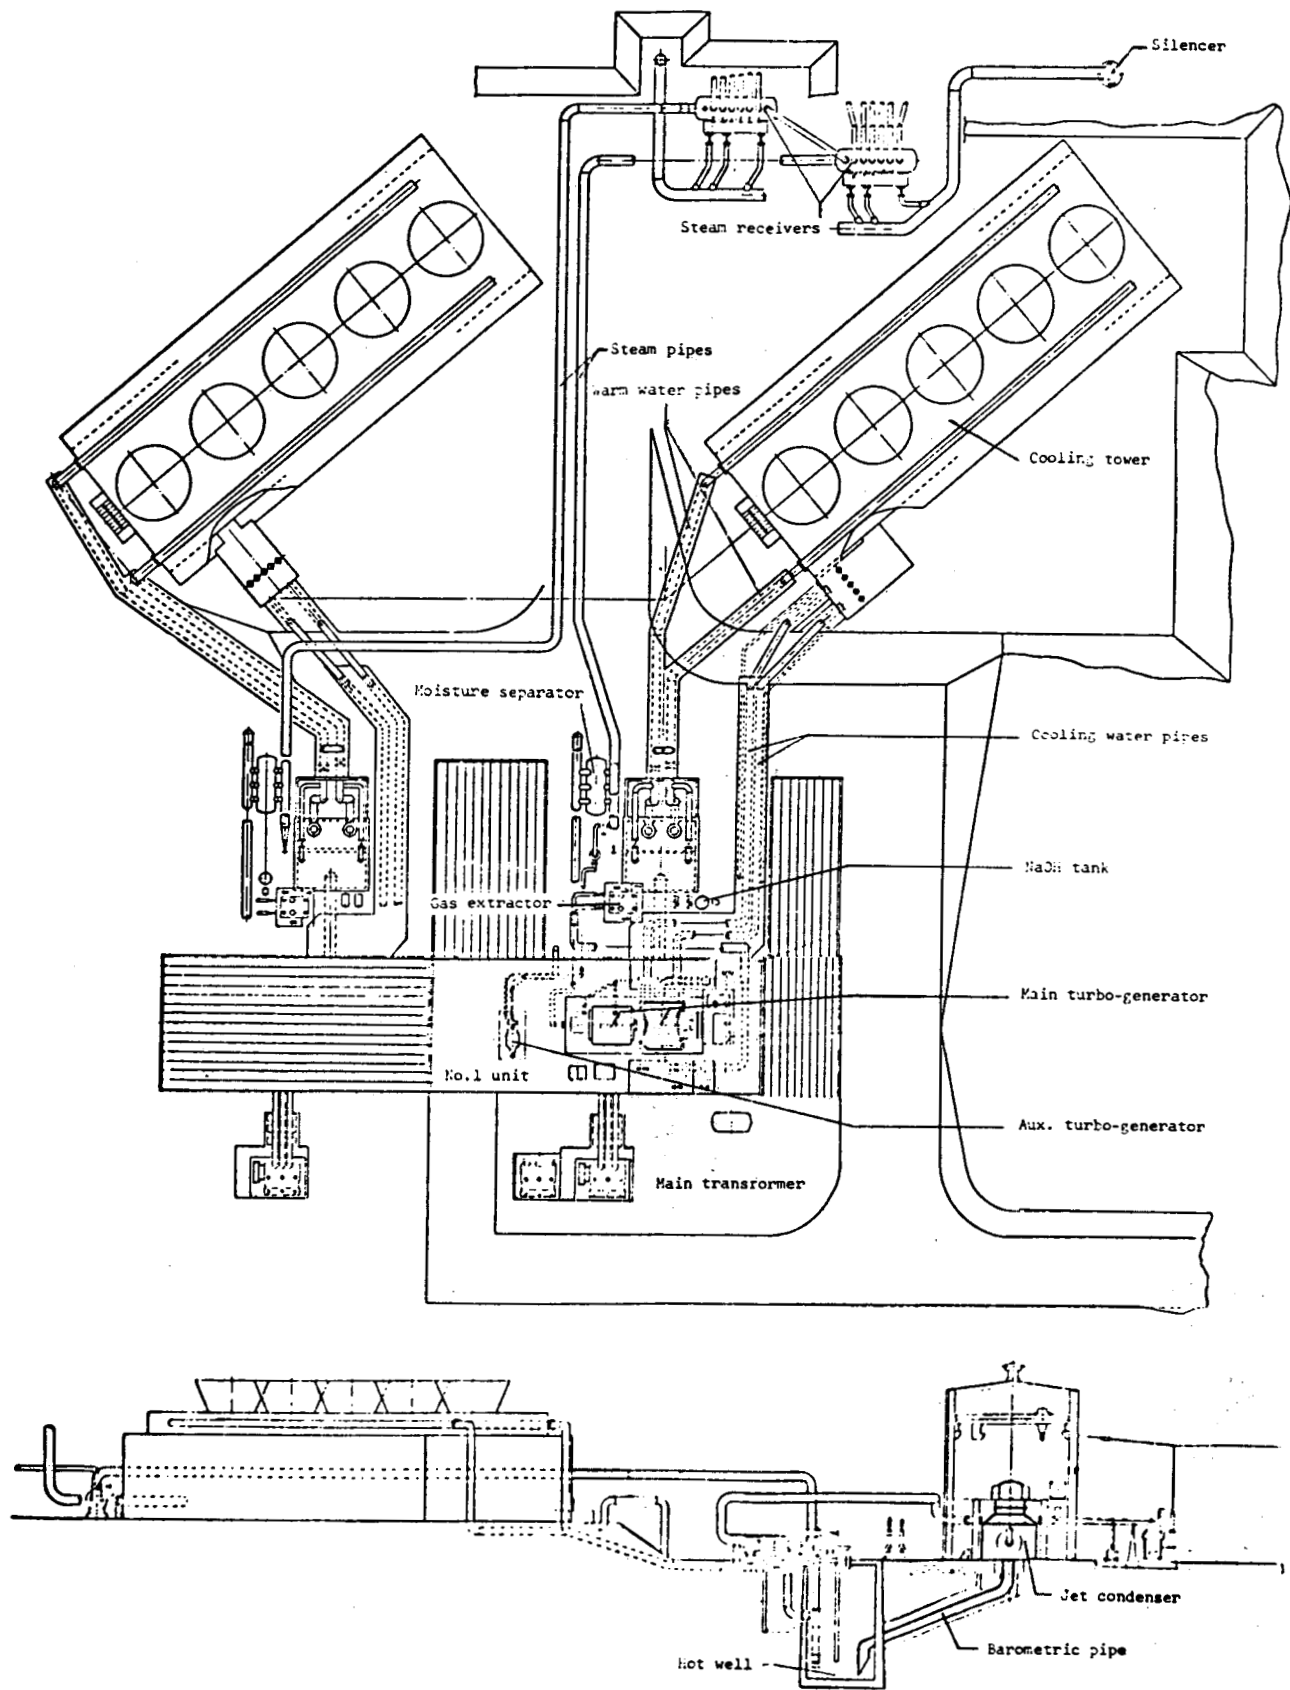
Power plant site arrangement: Ahuachapán units No. 1 and 2 [MHI, 1977].
